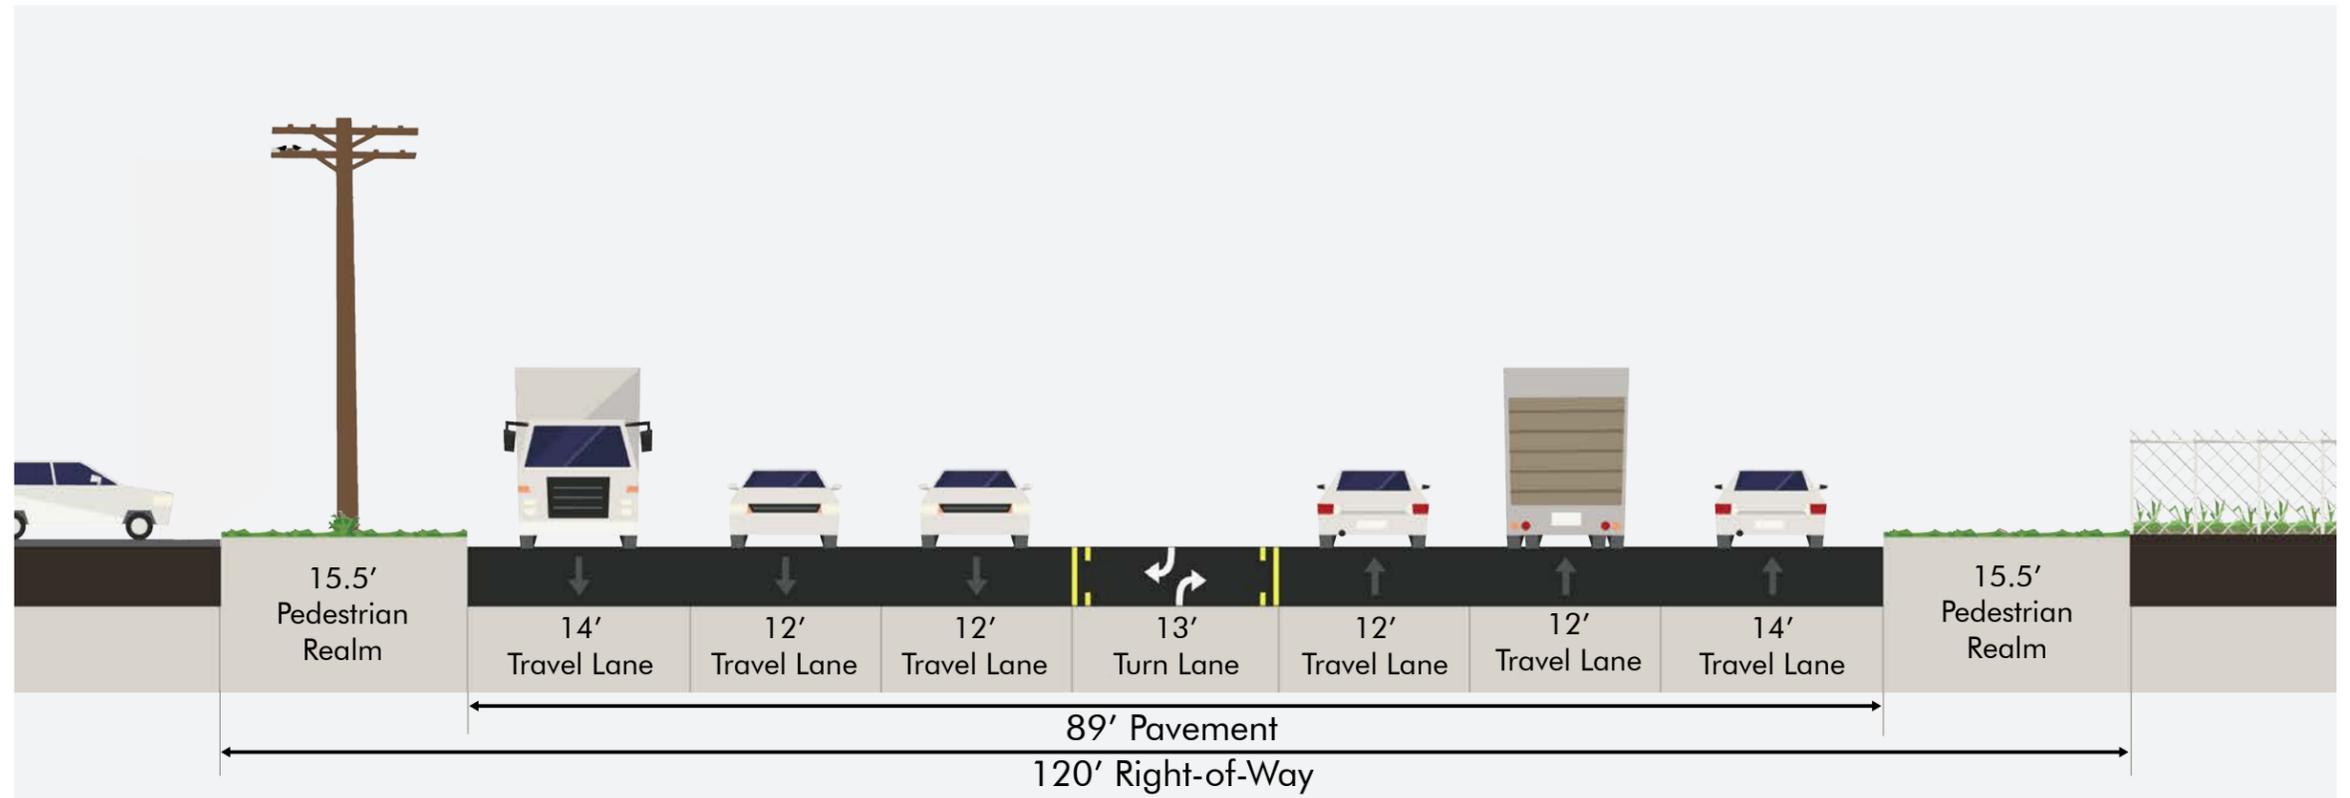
FM 1092 Study Corridor Typical Cross Section
